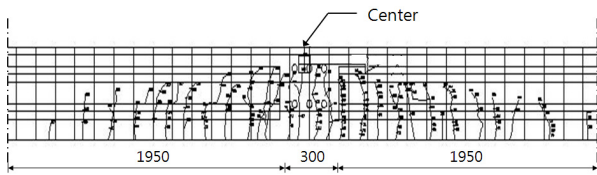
Crack Propagations of HPPCLA Single Girder
